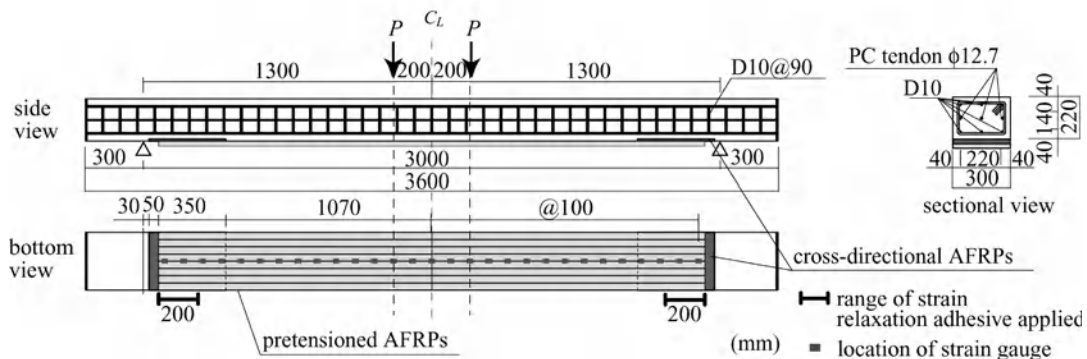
Layouts of reinforcement, PC tendon, and AFRPs
